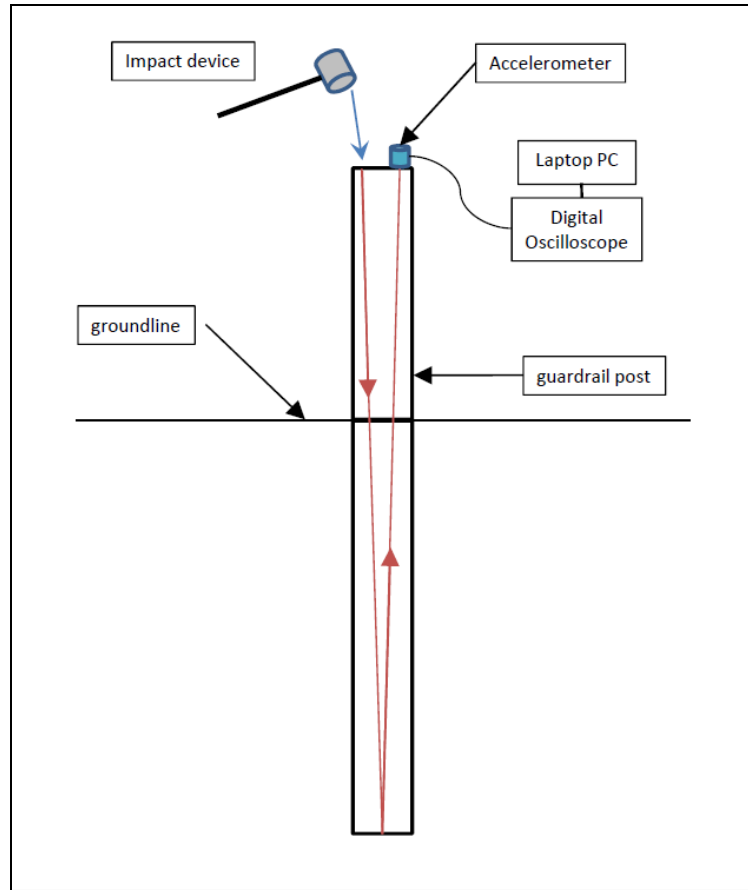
Section view of impact-echo NDE evaluation technique used in the guardrail post inspections
